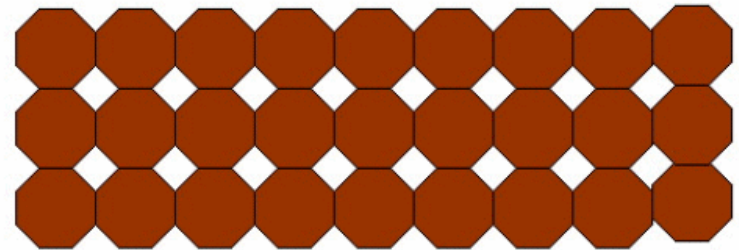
Schematic of Ecostone permeable concrete block paving stone pavement (Gerrits, 2001).
